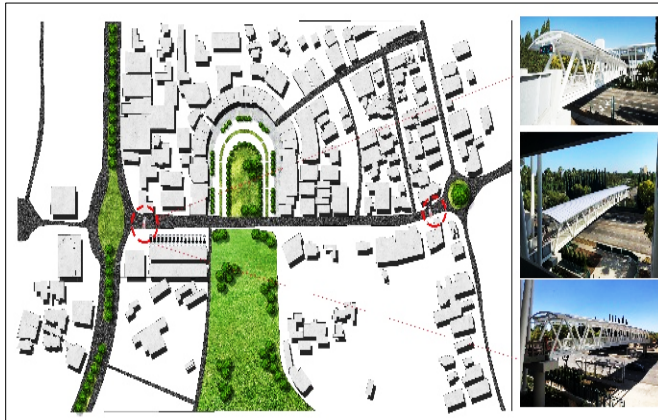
Pedestrian Bridge - Plan & Conceptual view
